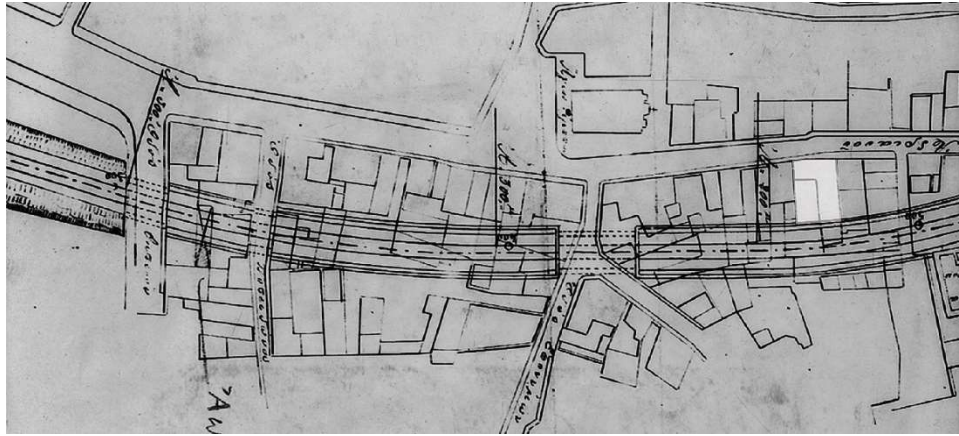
Drawing of planned Athens-Piraeus Railway through Hadrian Street sections by German Institute, Athens, 1890. 36 Hadrian Street highlighted in white. Agora Excavation Archives 1997.01.0040.
